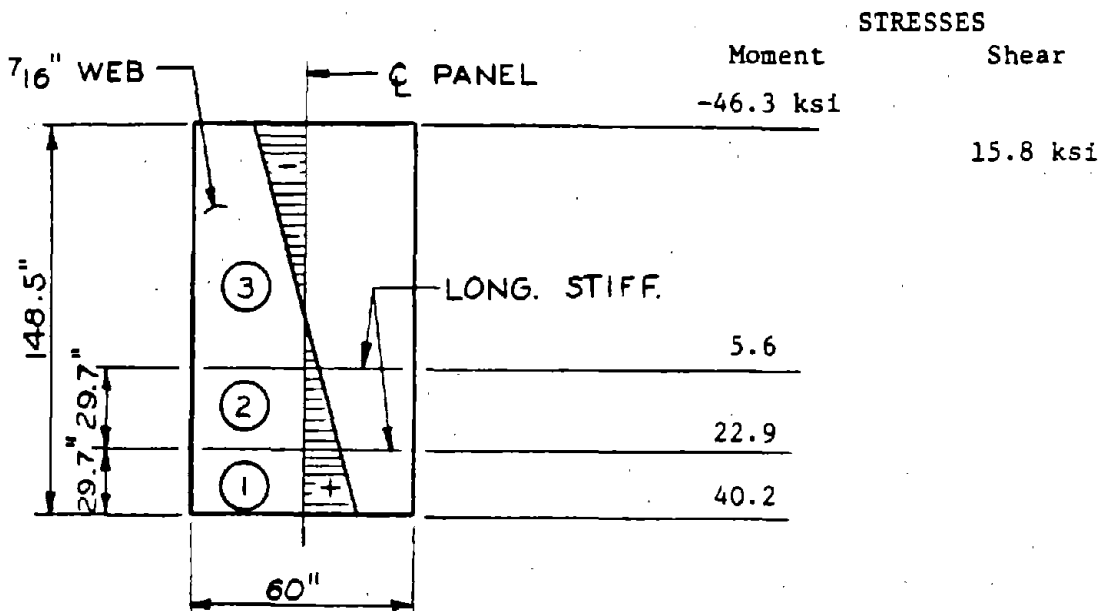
WEB PANEL - NEGATIVE MOMENT DESIGN - PROPOSED SPECIFICATIONS
